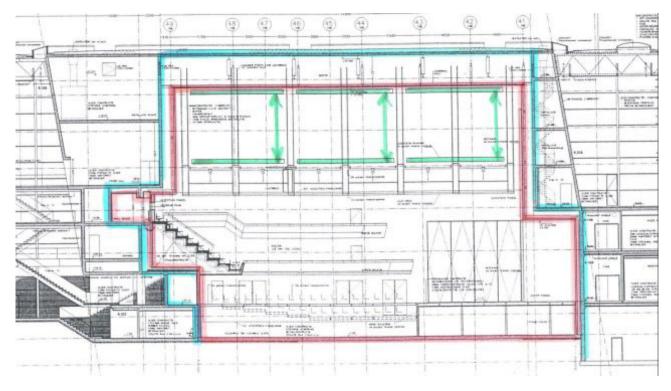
Section of the concert hall showing the ceiling height that can be adjusted. Source: Luykx & Metkemeijer (2006).
